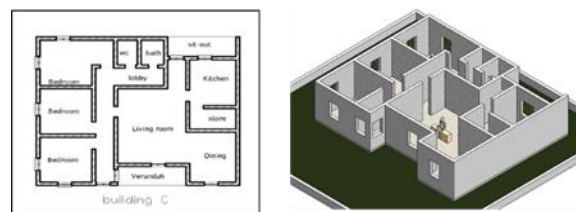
Building C floor plan and 3D model in Autodesk Revit 2018
